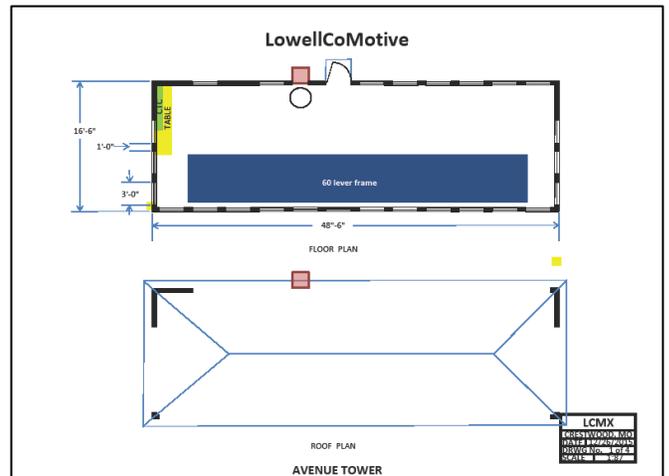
Fig. B: Avenue Tower Floor Plan and Roof Plan.
